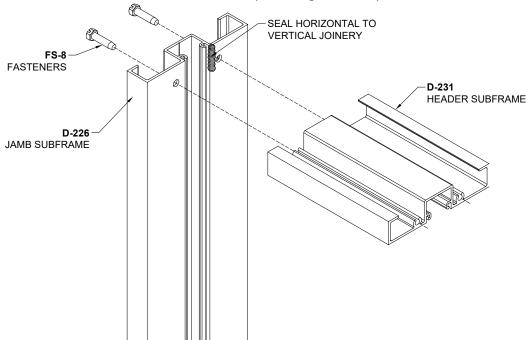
Curtain Wall Subframe Assembly at Header for Surface Closer
